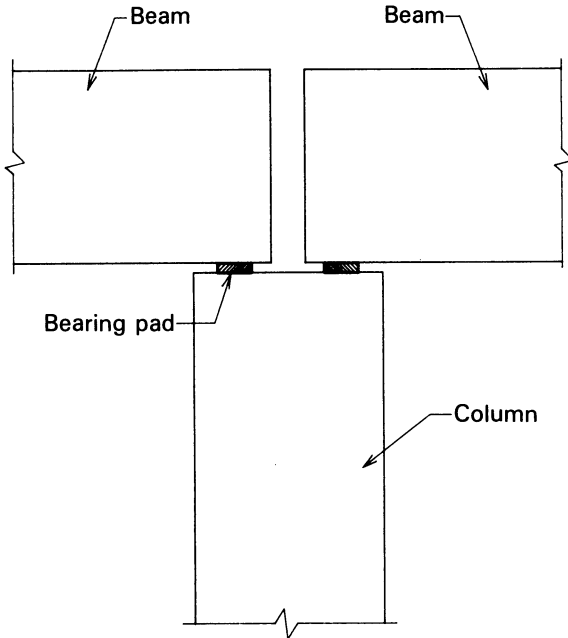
A precast concrete column head supporting two precast concrete beams.
